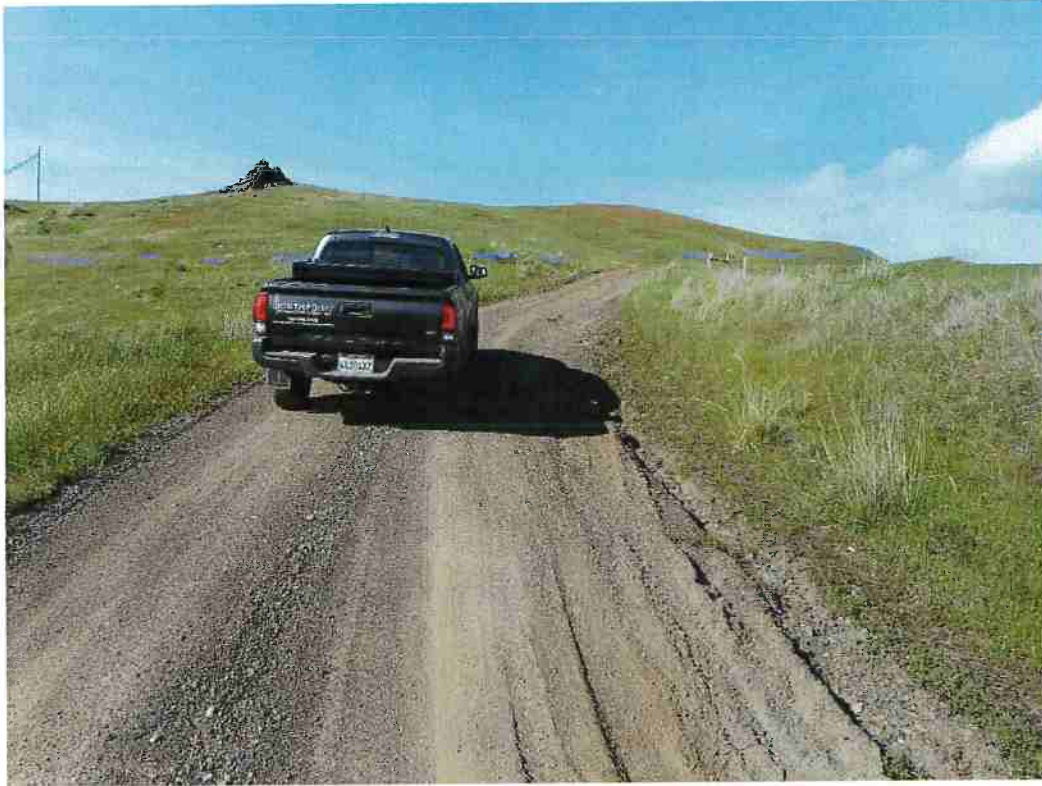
RP 6. Location of rutting on road surface. Vehicle traveling north. Photo taking facing north.
